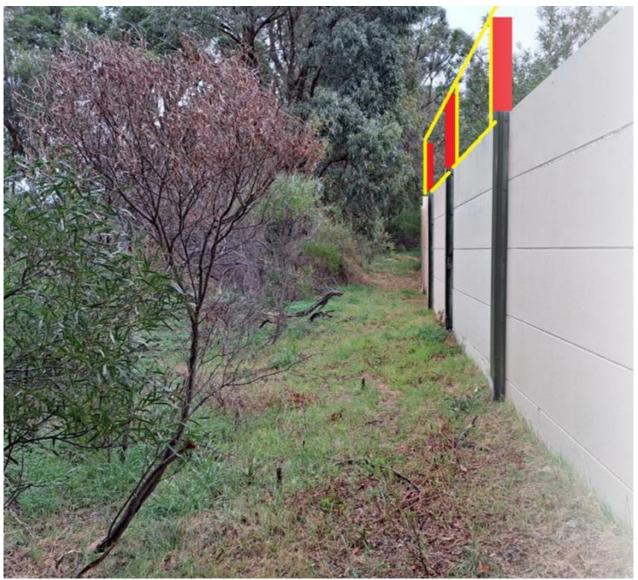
Proposed Acrylic Extension to Noise Wall Structure (NW17)
